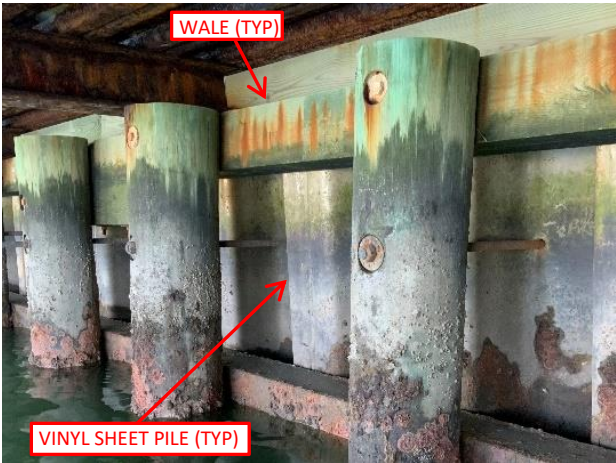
Underdeck view of bulkhead segment E, beneath wharf segment C.
